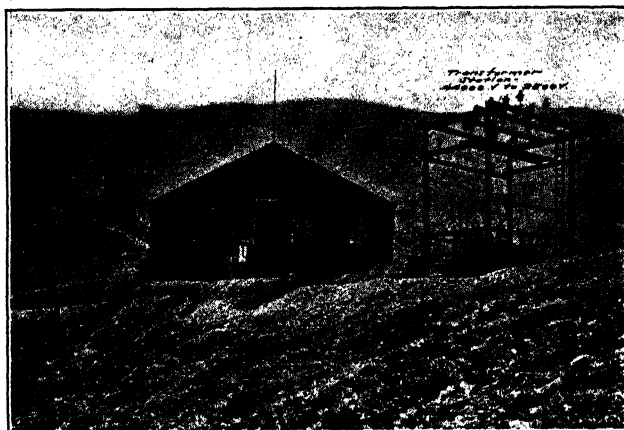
GENERAL OUTSIDE VIEW FROM REAR. TAKEN BEFORE INSTALLATION OF LIGHTNING ARRESTERS.
